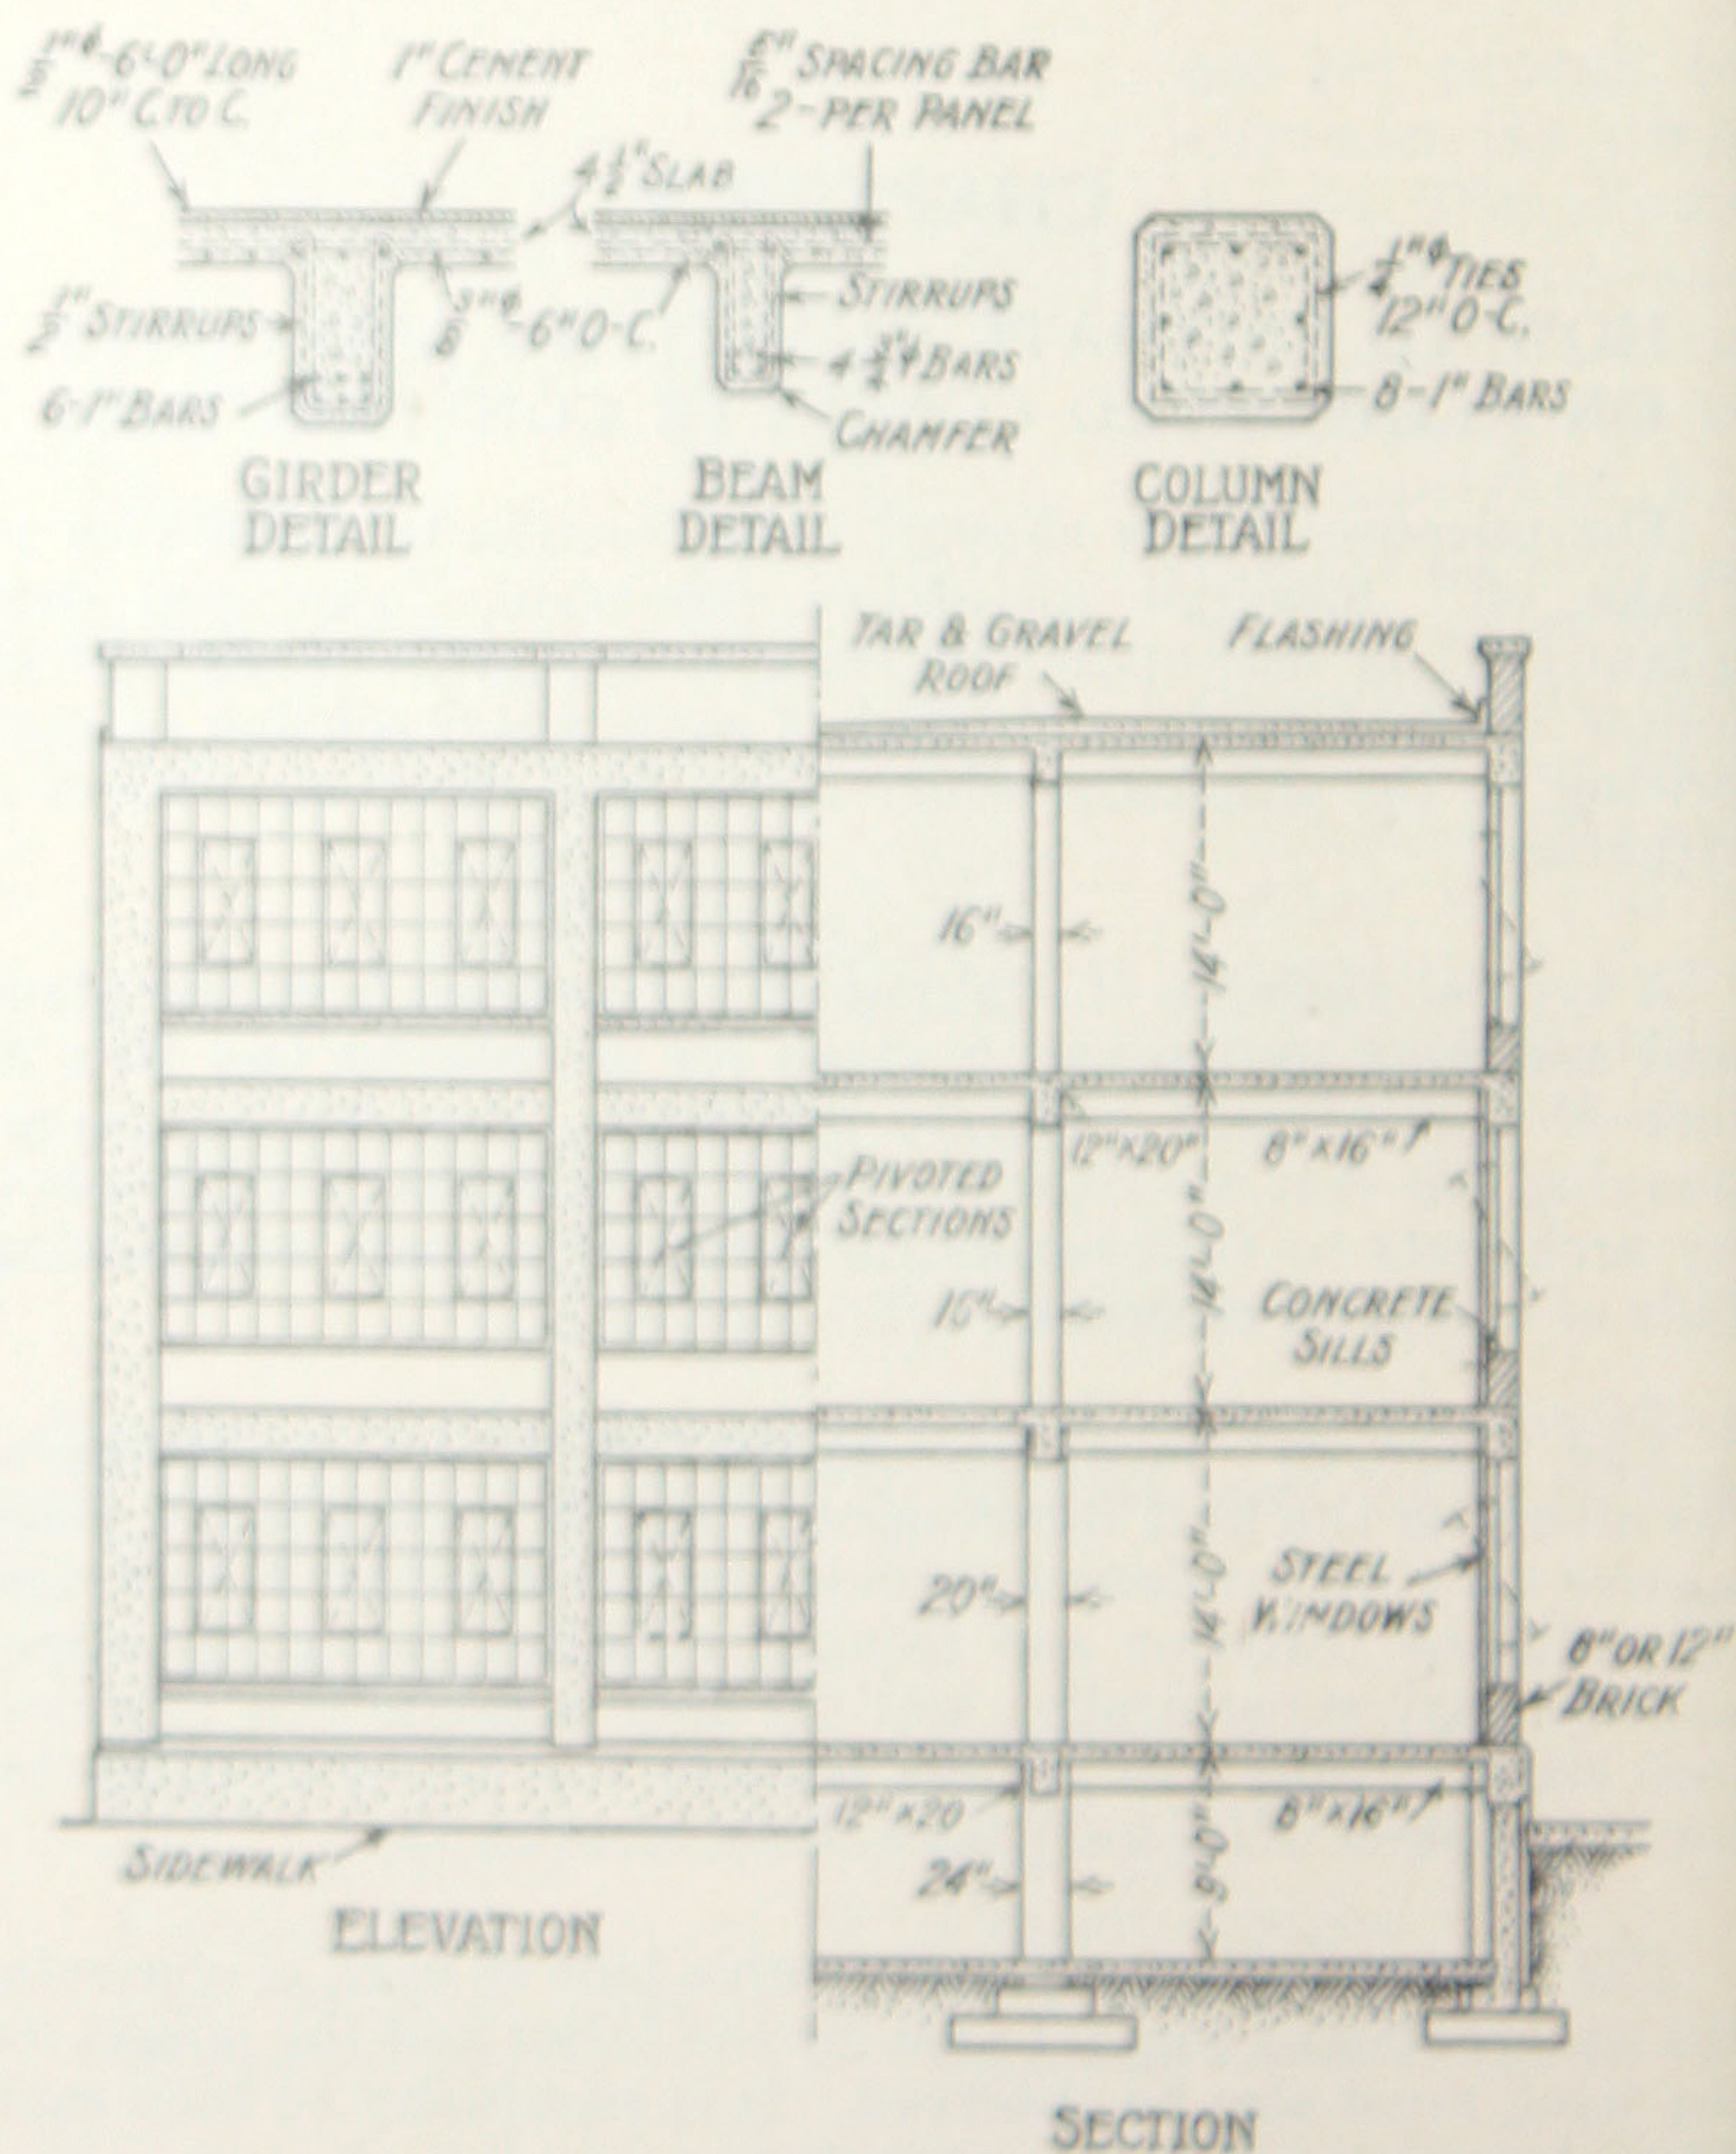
Section and elevation of a typical reinforced concrete building used as an example to show the way in which quantities are taken off and priced on the accompanying schedule sheets.
